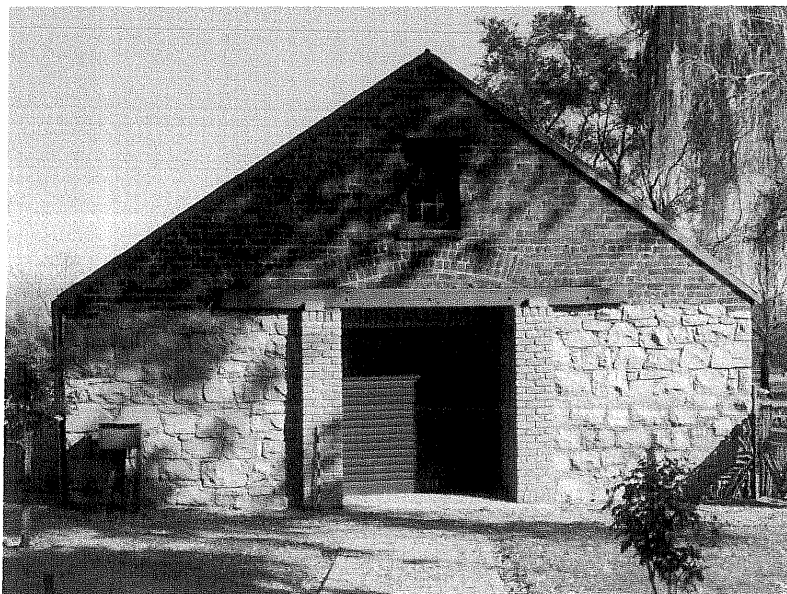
Eastern façade of the barn showing original stone walls and bricks. The door was added much later.
